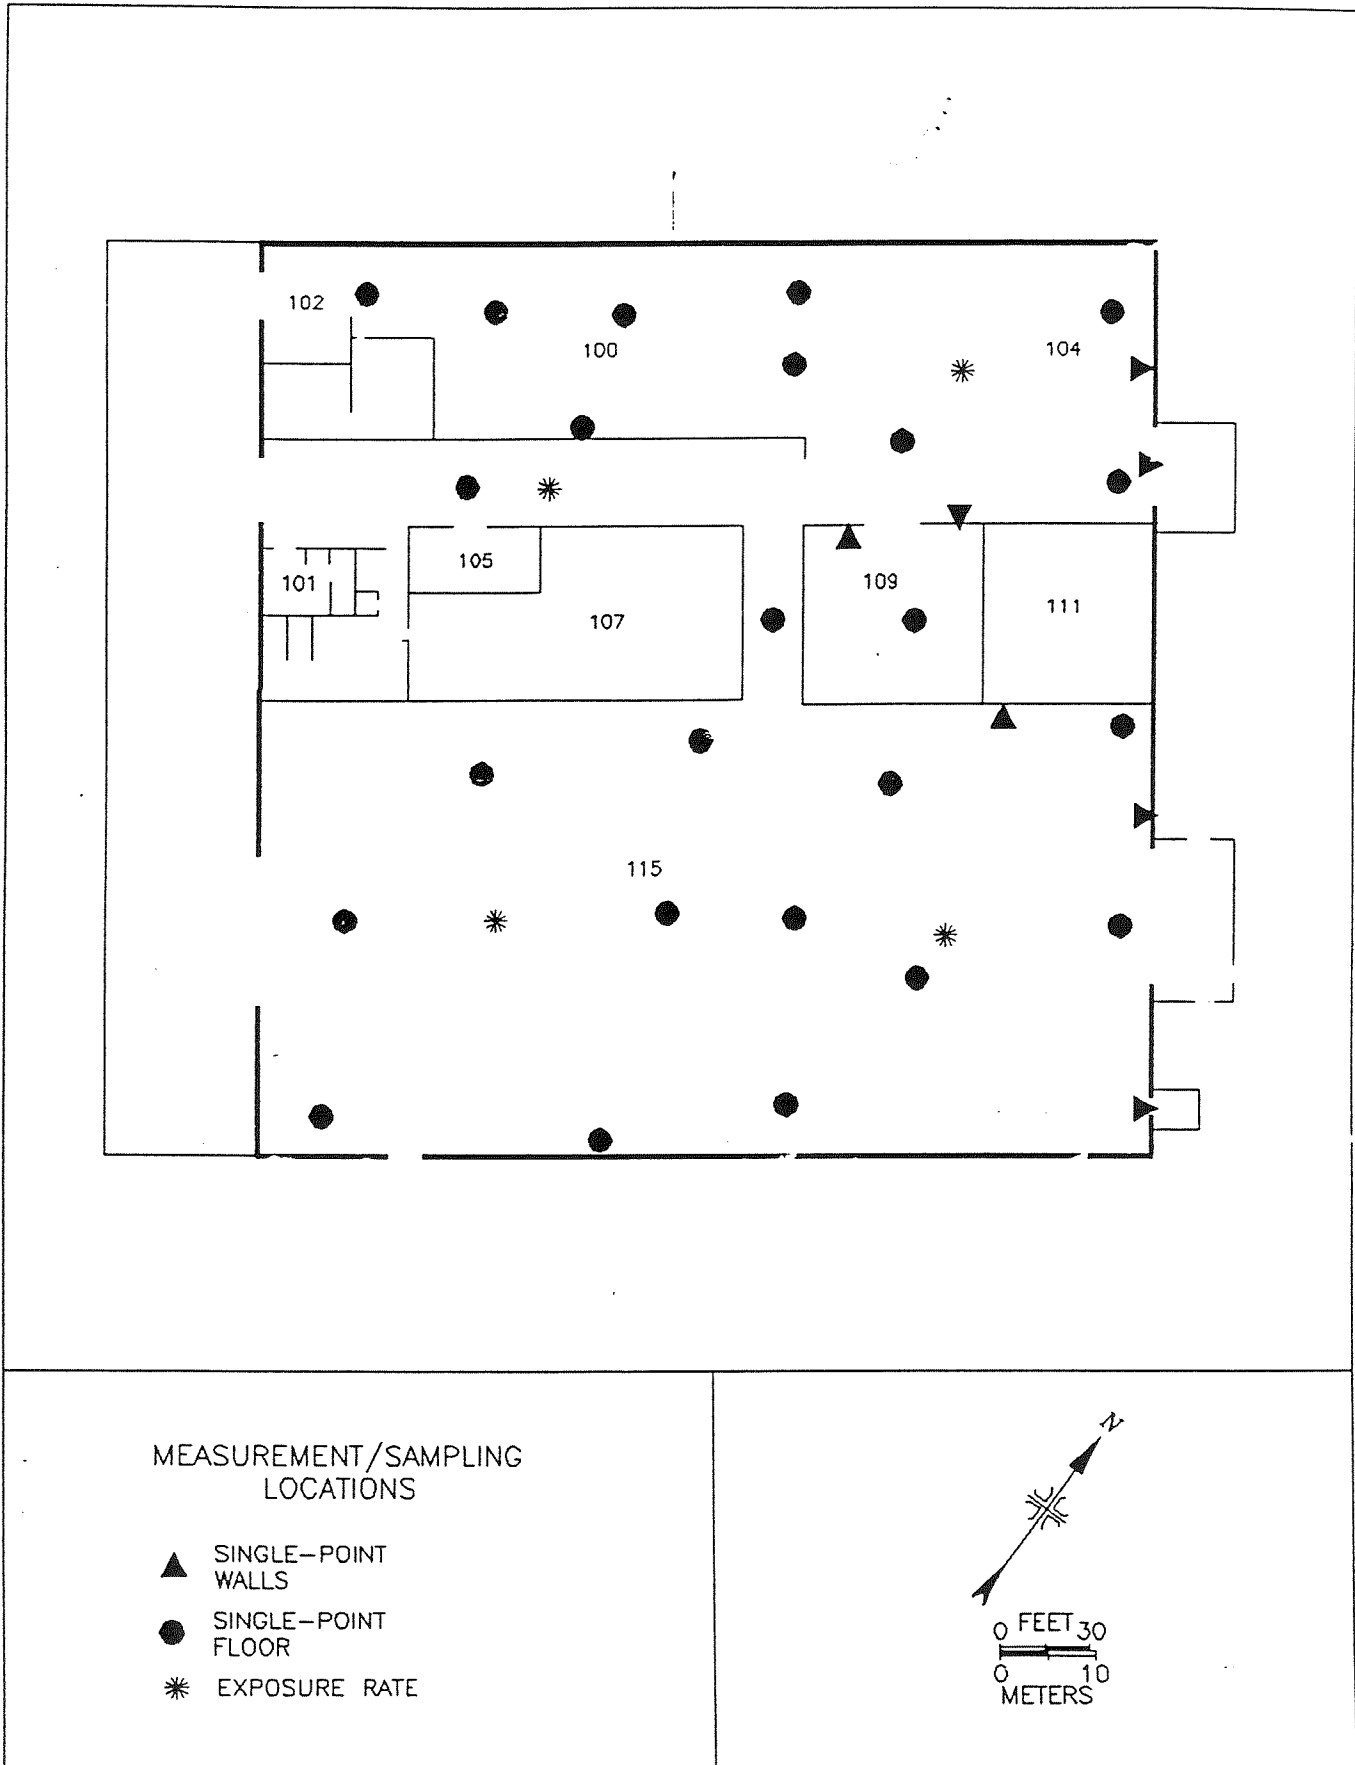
Building T013 – Floor Plan and Measurement and Sampling Locations
